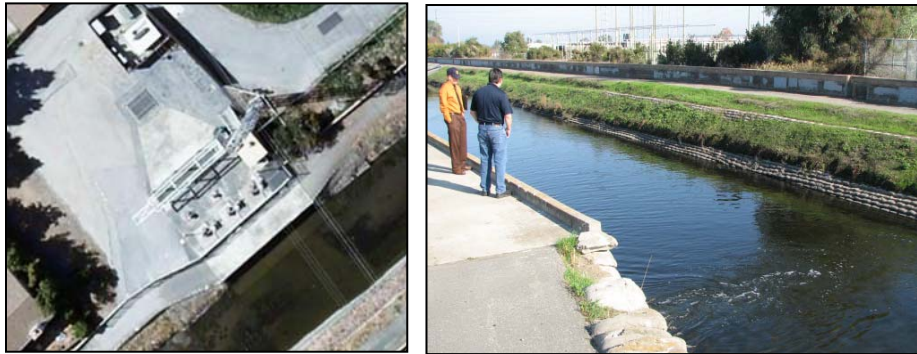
Matadero Pump Station (a) Overview and (b) Outlet Channel
